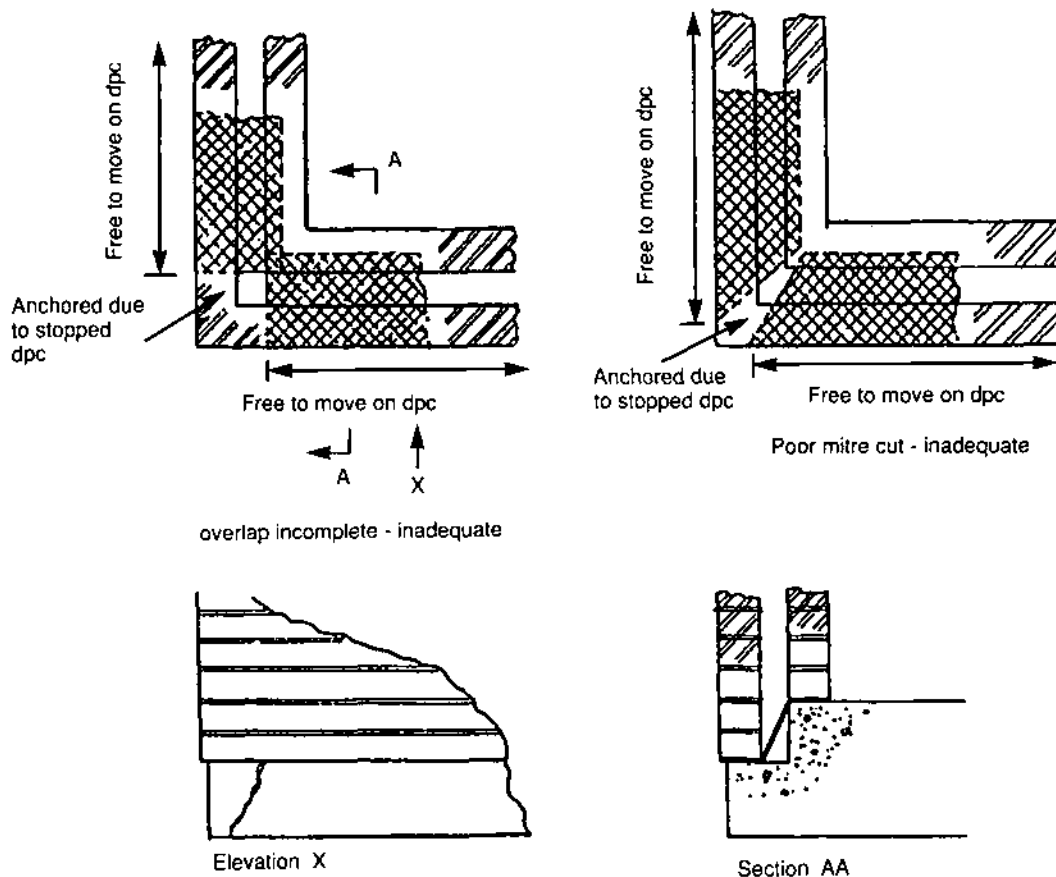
Cracking due to incorrectly stopped dpc with no cornerpiece
